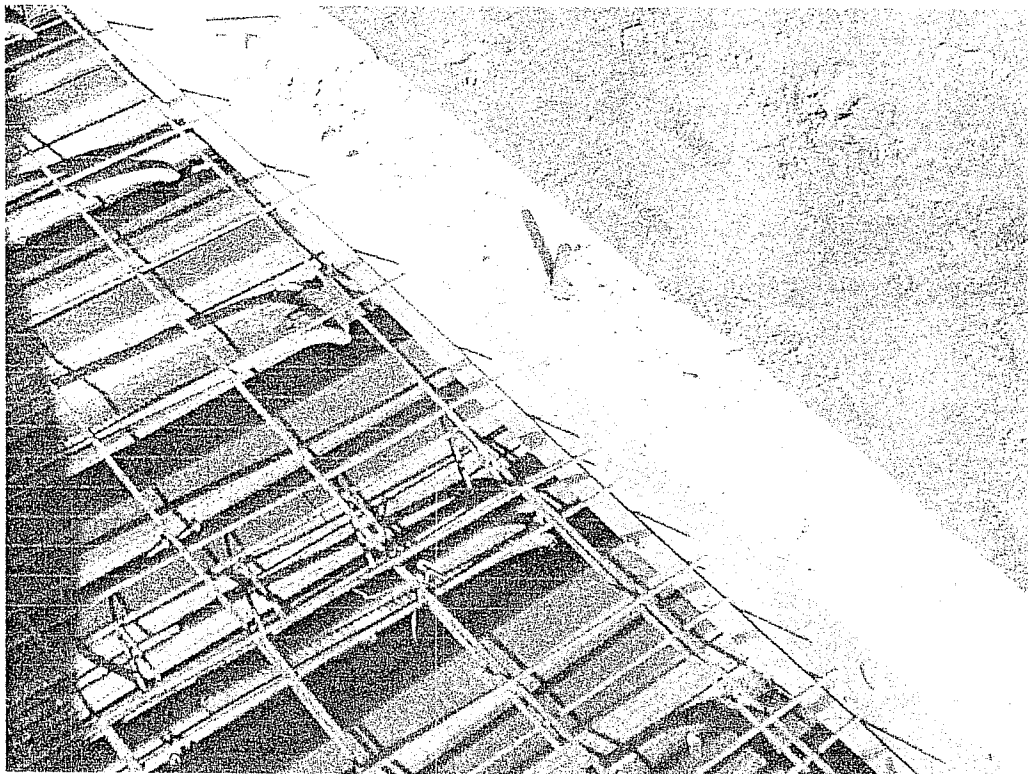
Deck adjacent to concrete basement wall - note bent bars.
